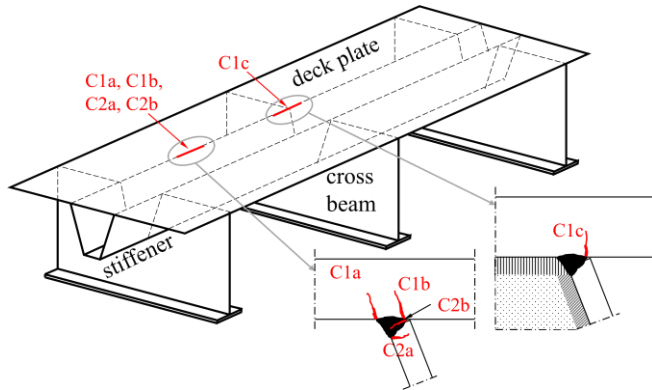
Orthotropic bridge deck with the five fatigue-sensitive details in the traditional, single-sided stiffener-to-deck plate connection
